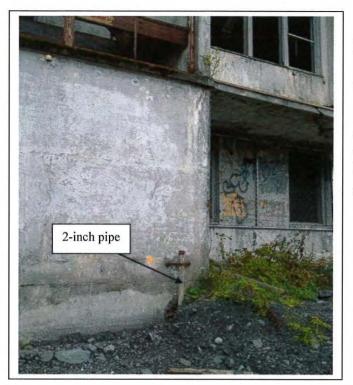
Two-inch pipe observed near the northwest corner of Section C; looking southeast. Note that based on the size, location, and construction of the pipe, the pipe may be a vent pipe associated with an undocumented UST. (September 8, 2014)
